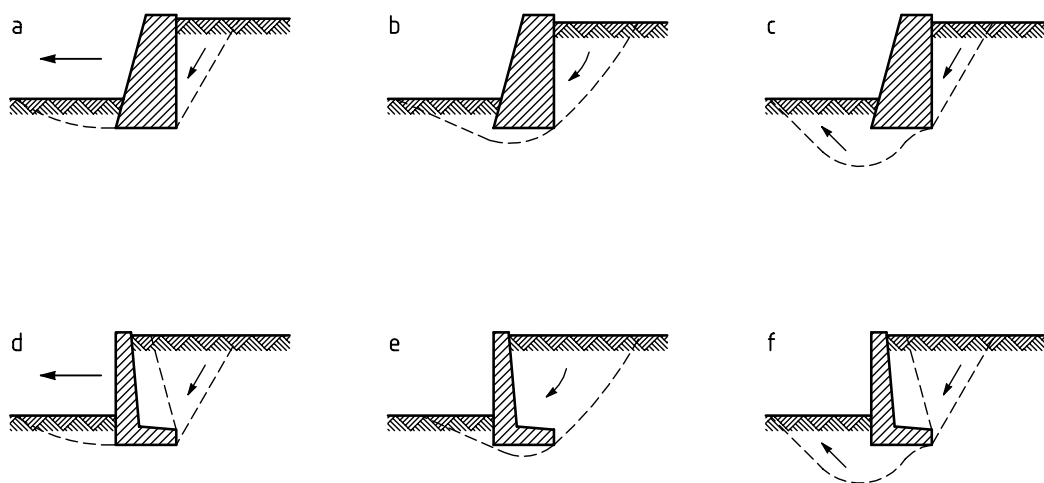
Examples of limit modes for foundation failures of gravity walls.
